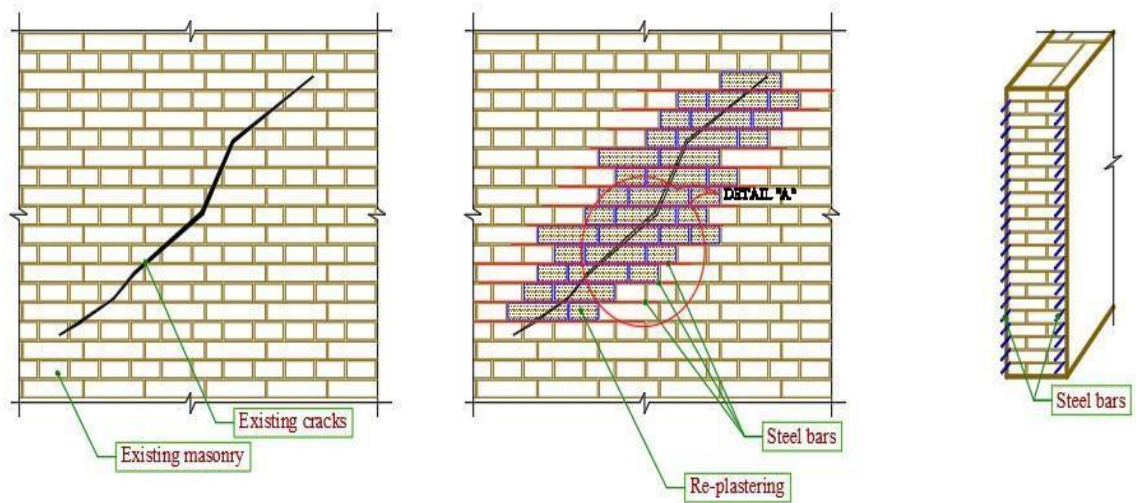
Reinforcement of masonry with cement mortar plaster and steel reinforcing
